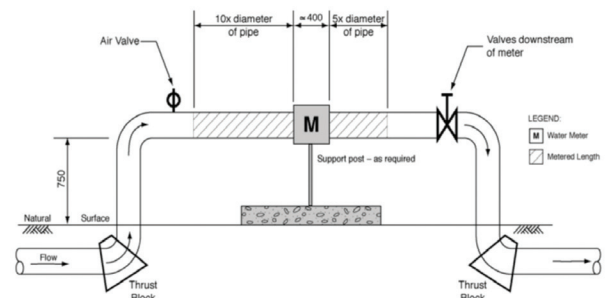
Typical water meter installation diagram (Source: Lund 2006)
